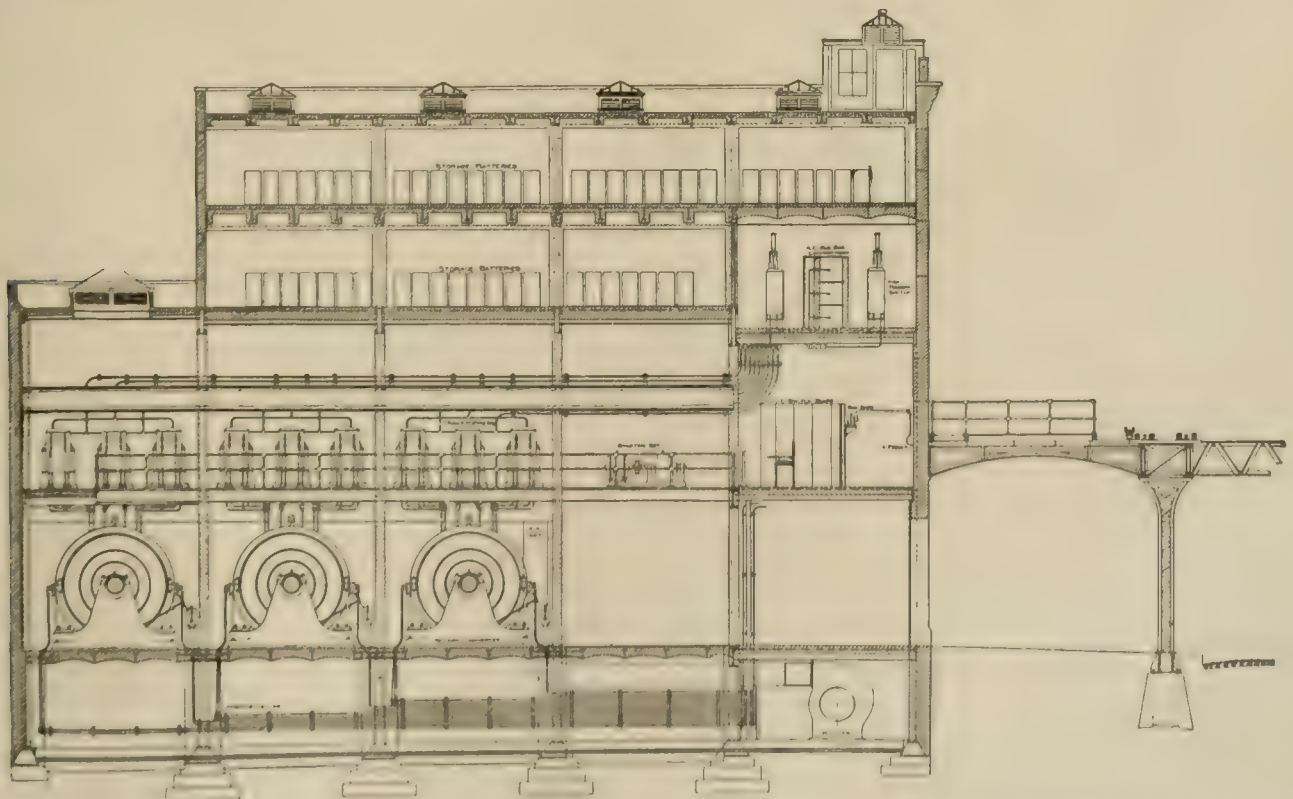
LONGITUDINAL SECTION OF SUBSTATION, MANHATTAN RAILWAY. CAPACITY, 12,000 KW.
